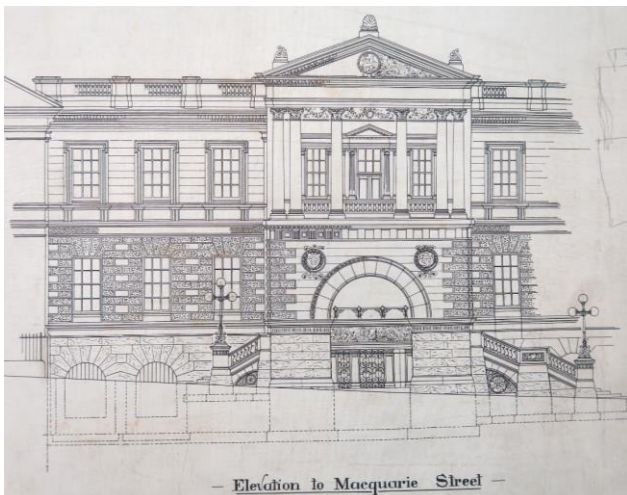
Eastern elevation to Macquarie Street of Link Building (generally as constructed)
